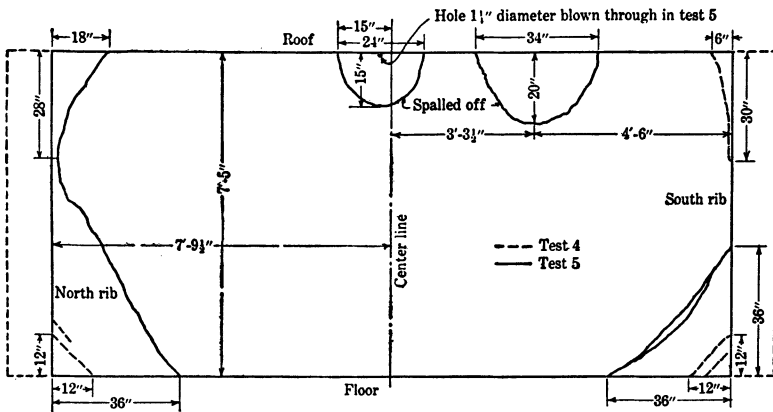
Cracks in inner face of stopping 5 formed during tests 4 and 5
